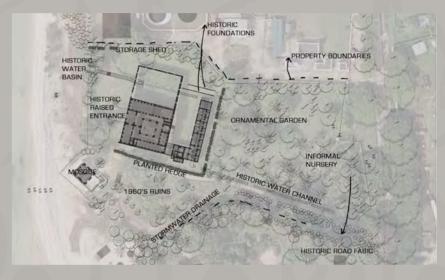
Plan indicating current situation on the site (Author, 2014).
